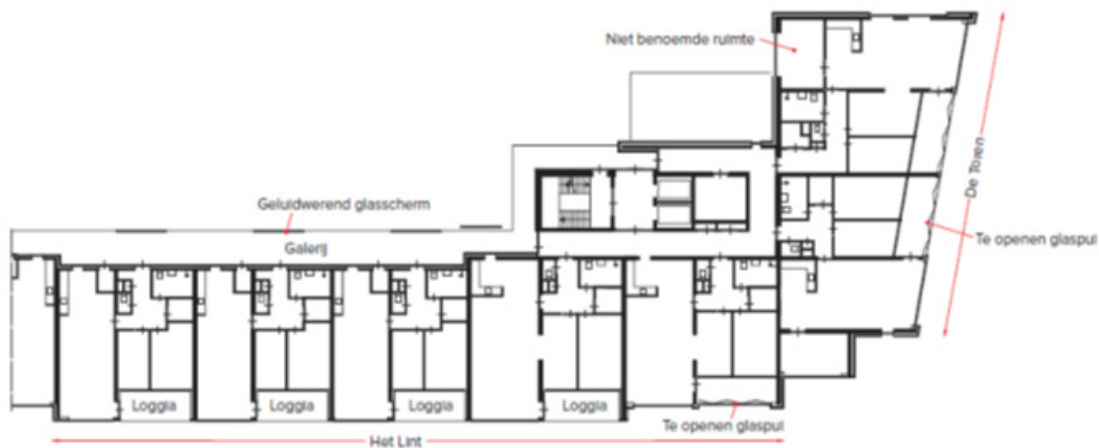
Paulinesymfonie floor plan (Bogaerts, 2016)
